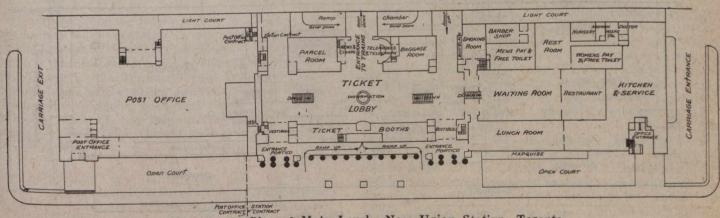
Plan of Main Level, New Union Station, Toronto
